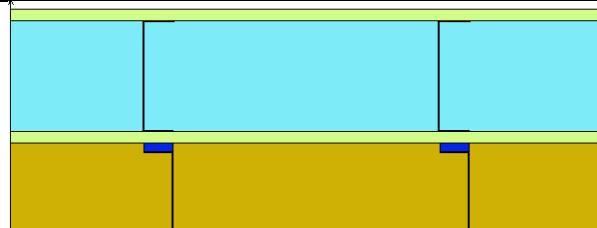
Plan View Uninsulated Steel Stud (SS) Assembly
